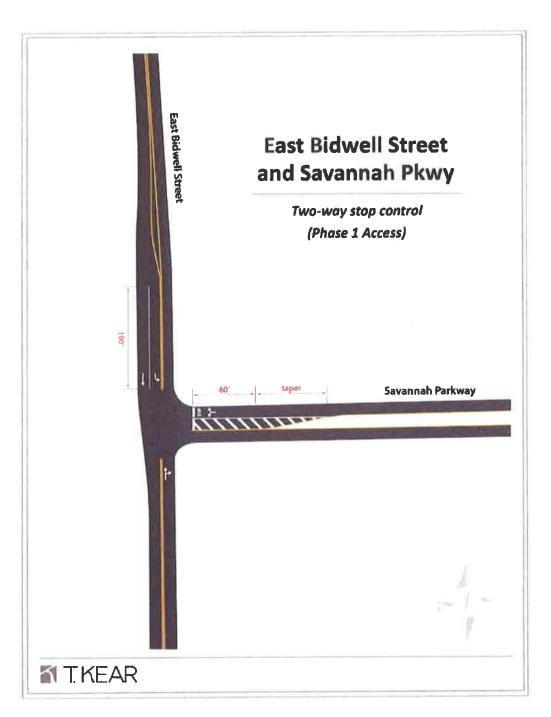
East Bidwell Street/Savannah Parkway TWSC
